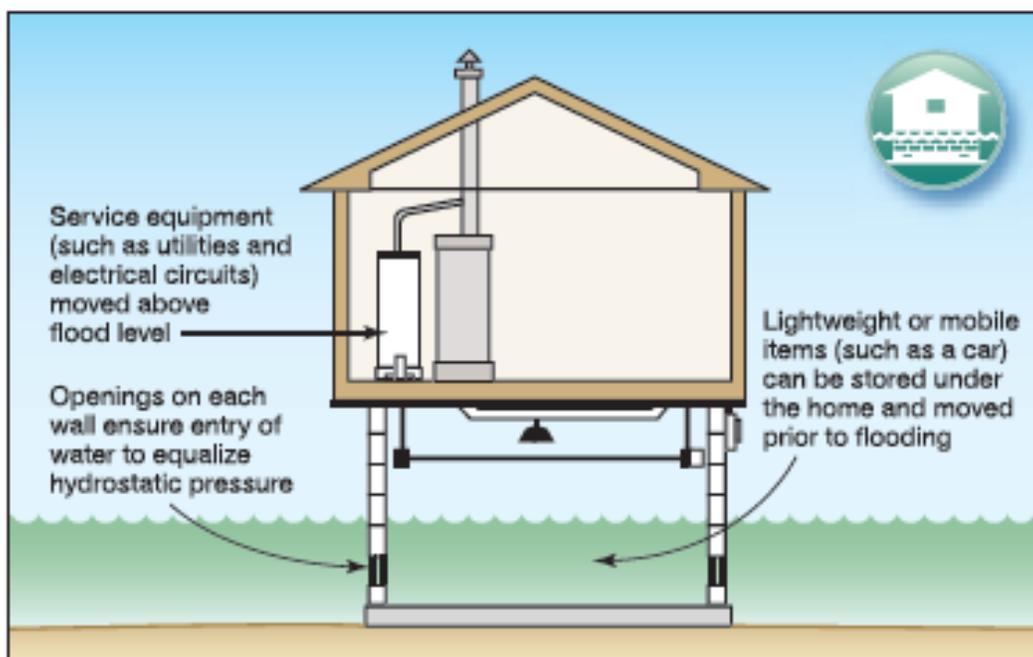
Home Elevation Concept Diagram (Courtesy of Google Images)
